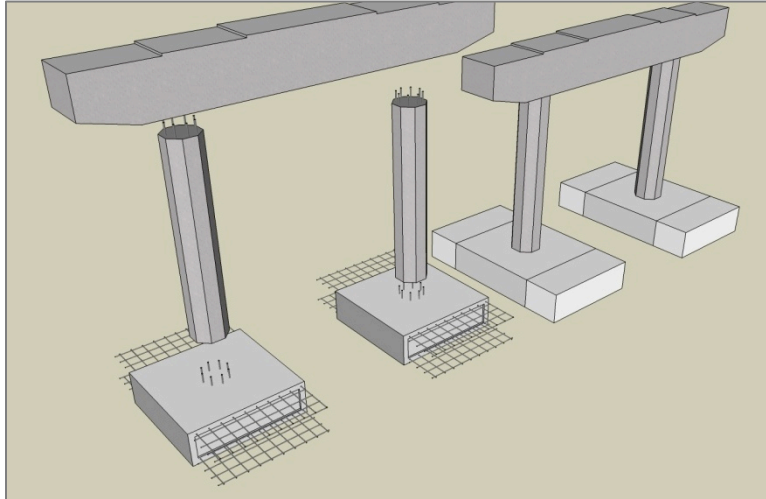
Corrugated Column End with Cast-in-place Concrete Footing.
